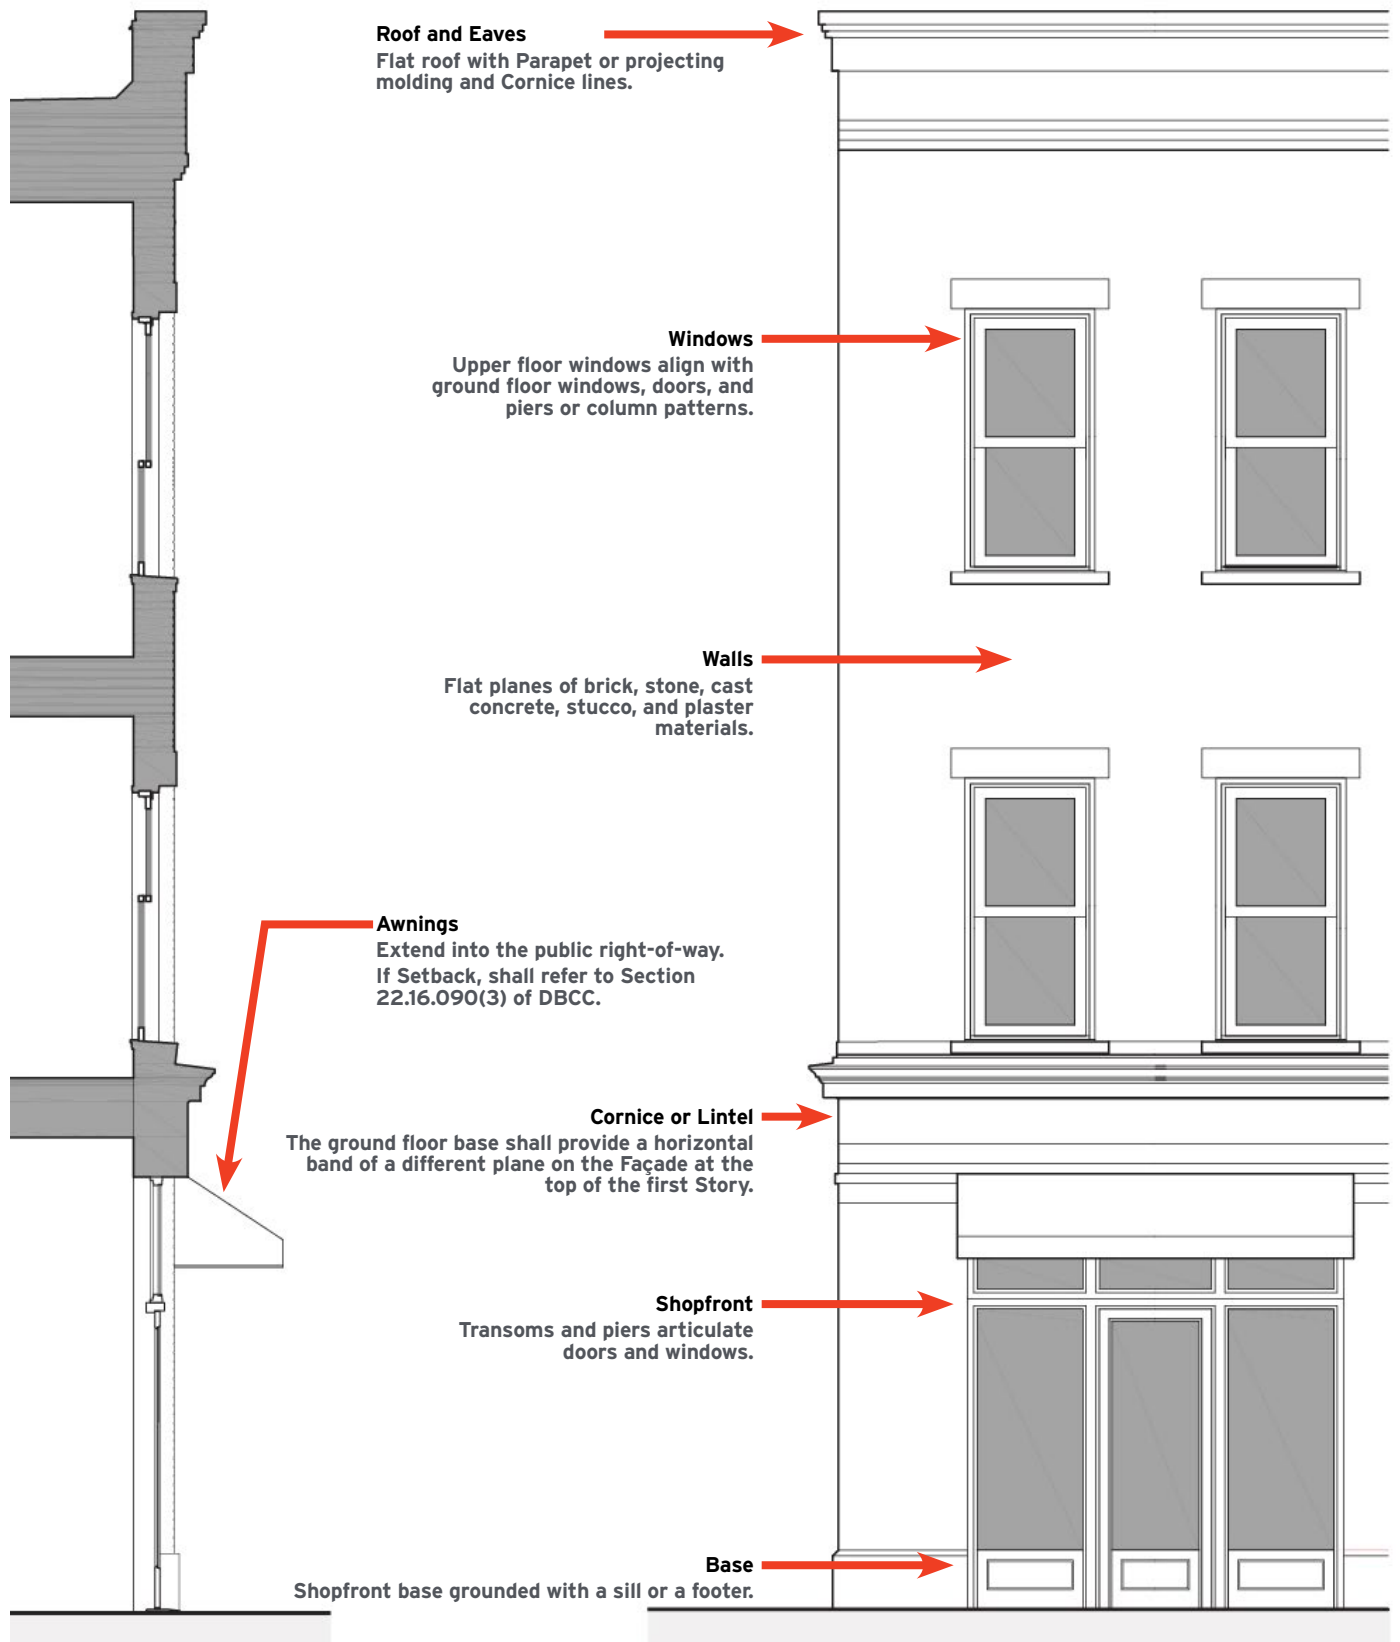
Main Street Commercial Elements Diagram (Ground Floor Commercial)
